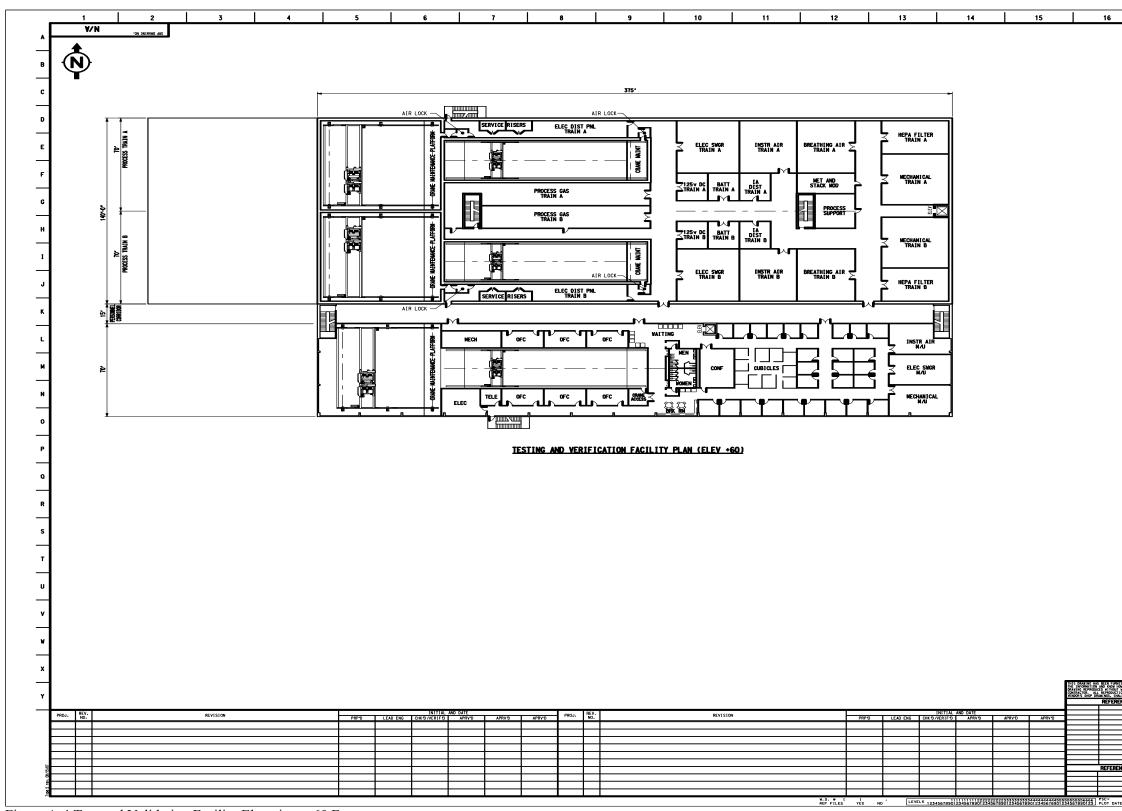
Test and Validation Facility Elevation + 60 Feet
